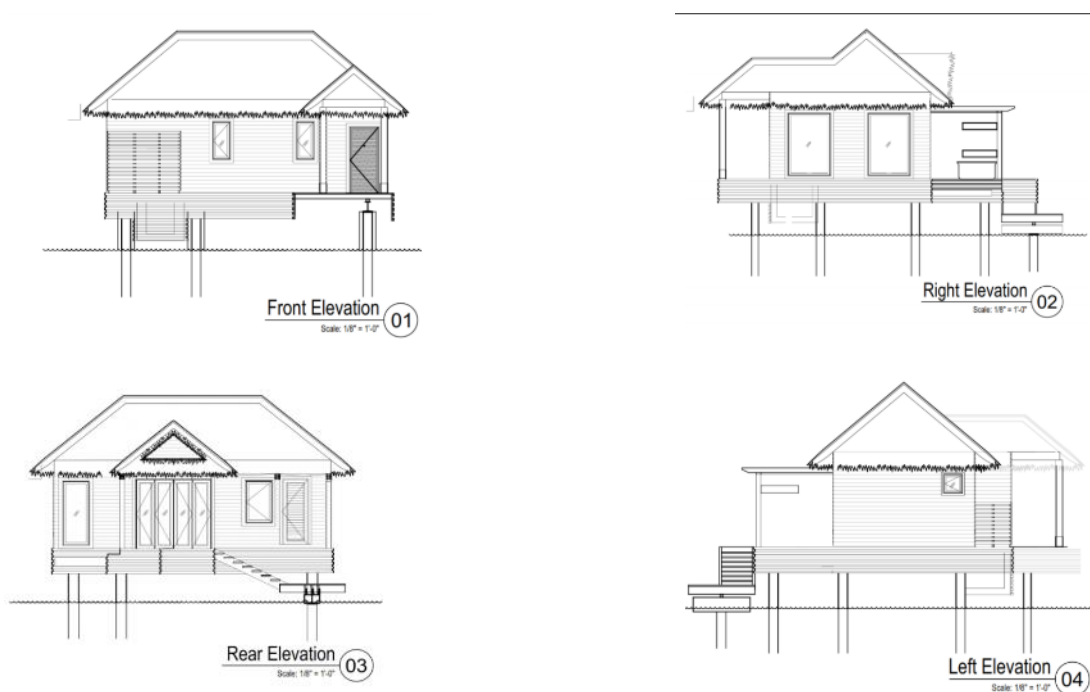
Cross-sectional elevations of overwater suites from which structural dimensions were assumed
